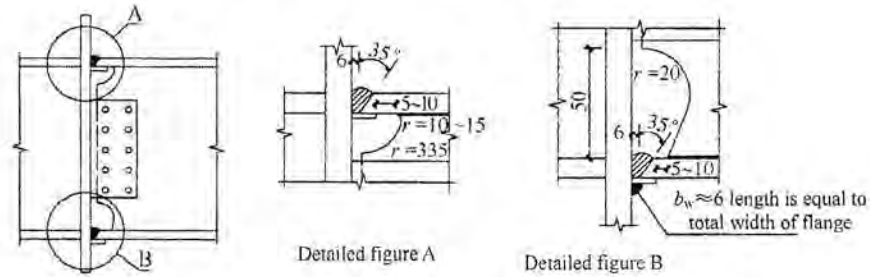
Field Connection of Frame Beam and Column
